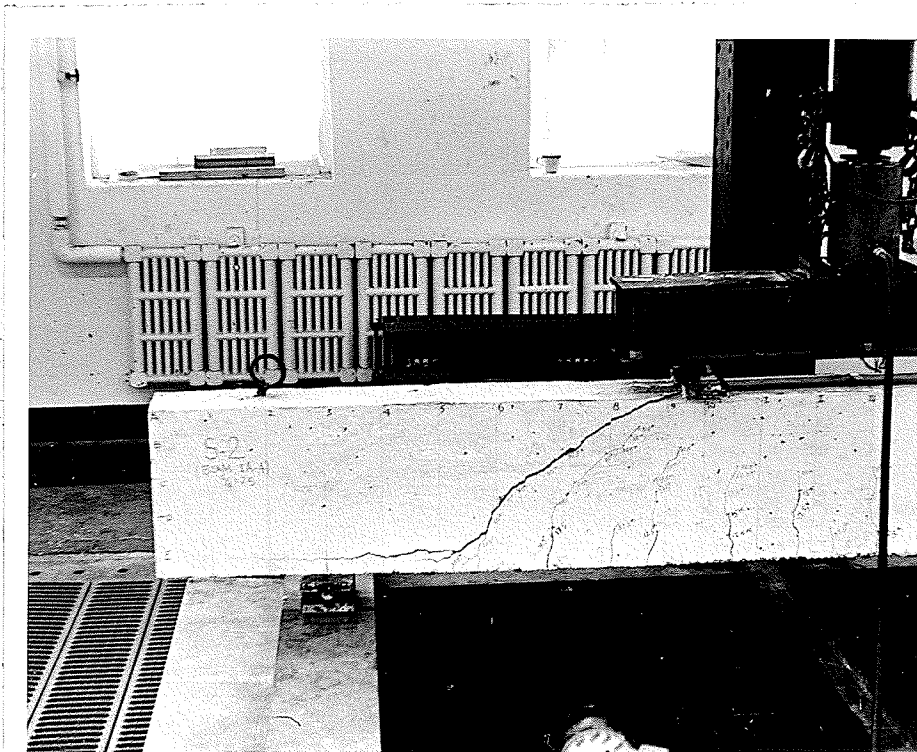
DIAGONAL FAILURE OF BEAM IA-4
